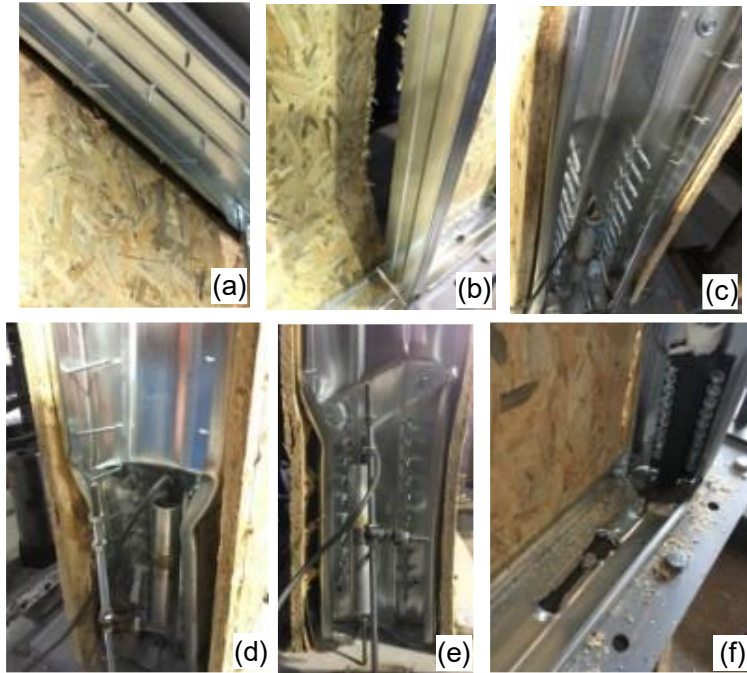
Observed deformations on wall specimens: (a) screw tilting, (b) screw head pull through; (c) initiation stud buckling; (d), (e) local/distortional buckling of boundary stud near wall base; (f) slip deformation and damage in bottom track around shear anchor and hold down in specimen MP-6
